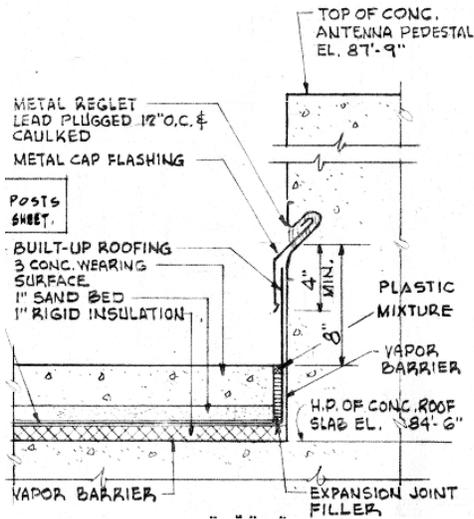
Roof-wall base flashing detail at concrete pedestal from original drawings.
